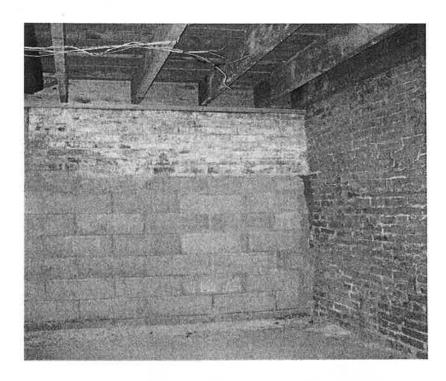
Figure U. West concrete masonry unit wall supporting existing brick masonry wall.
